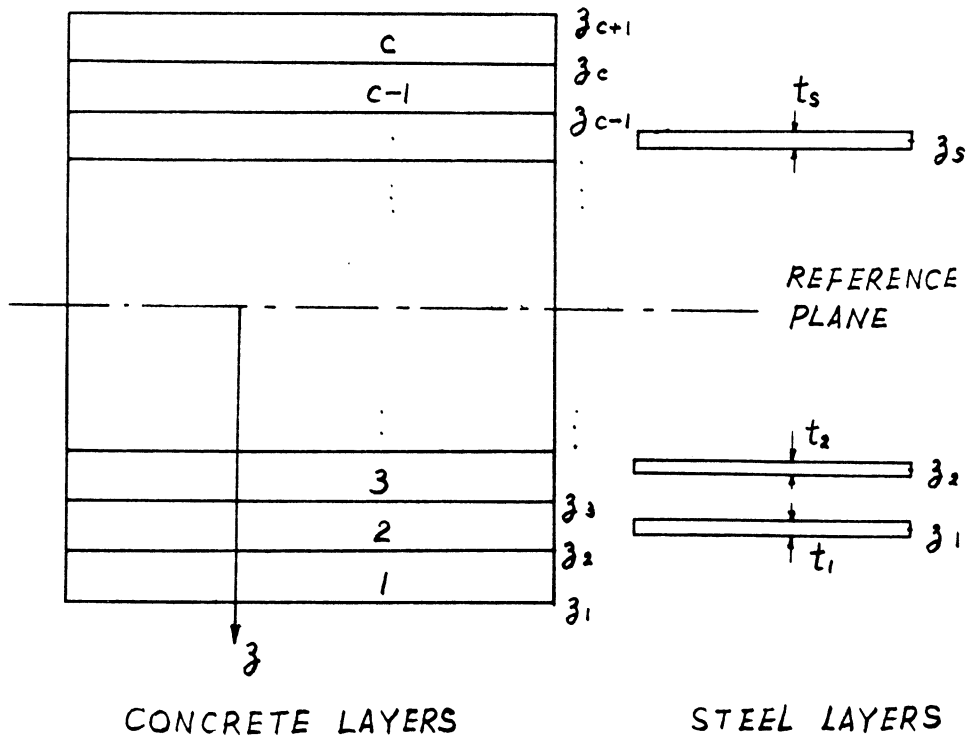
CONSTRUCTION OF A TYPICAL LAYER SYSTEM
